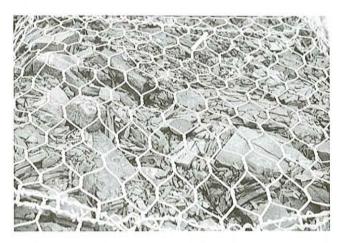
Premature deterioration of bedrock used as rip-rap in retaining wall, eastern Newfoundland.
